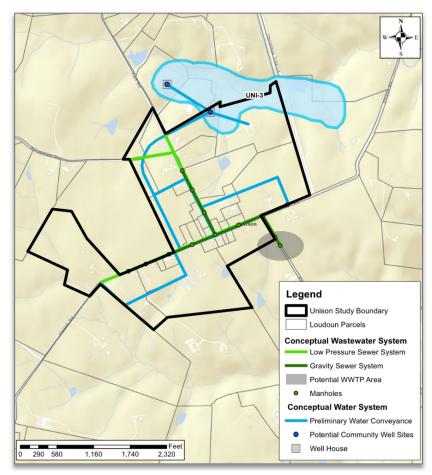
Recommended Conceptual Water and Wastewater System Layouts
